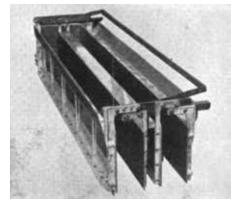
The Van Guilder hollow-wall molding machine⁴
